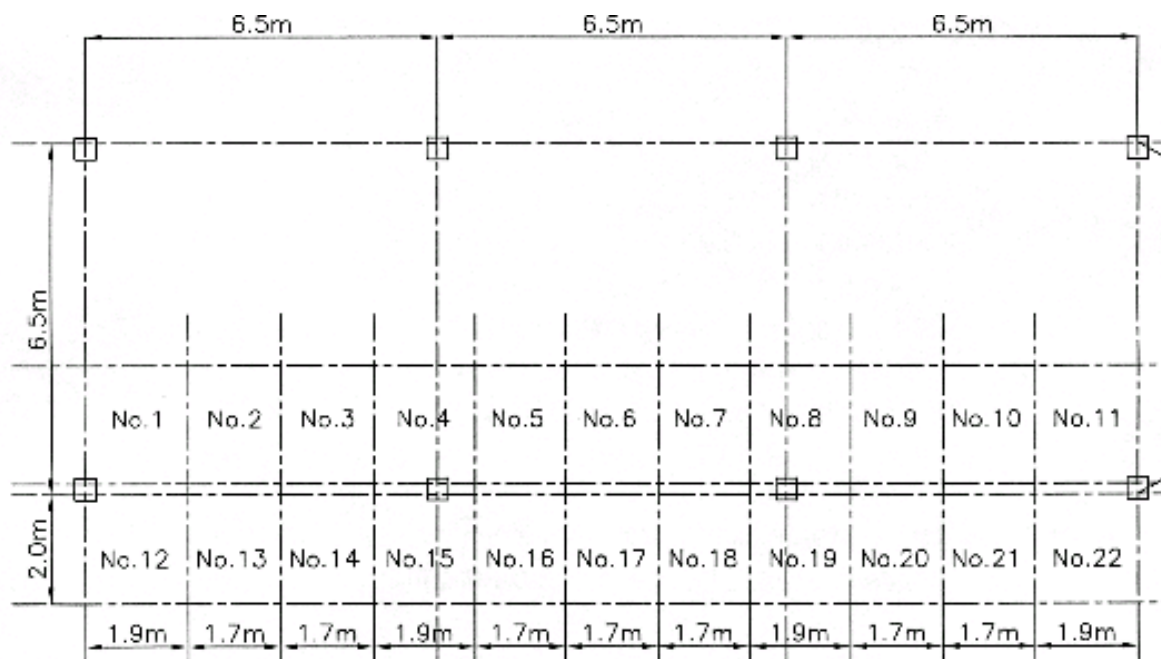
Layout of the New Fishing Gear Lockers
